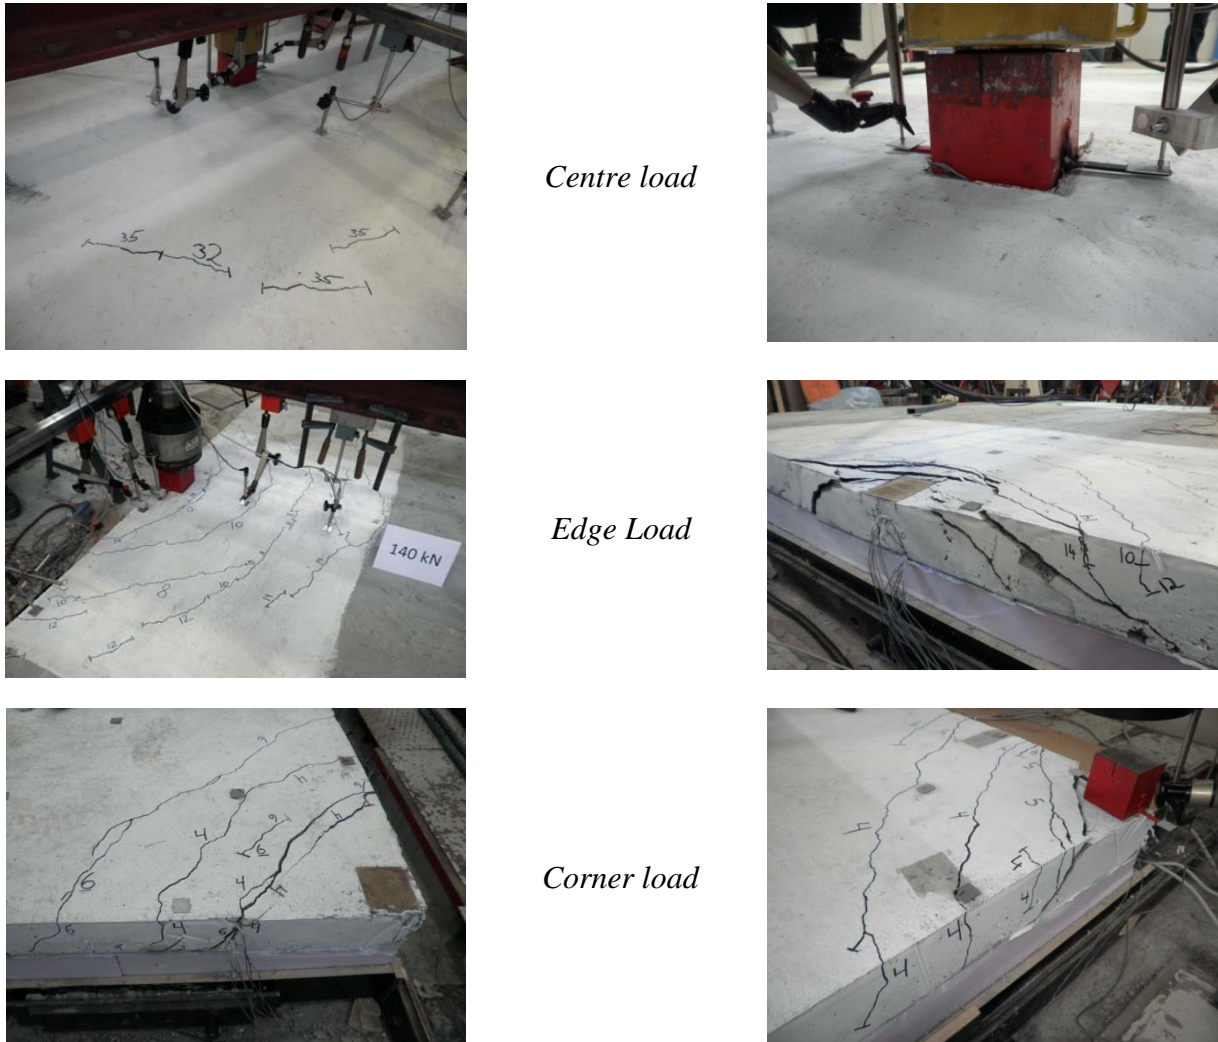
Crack patterns and failure for centre, edge and corner load.
